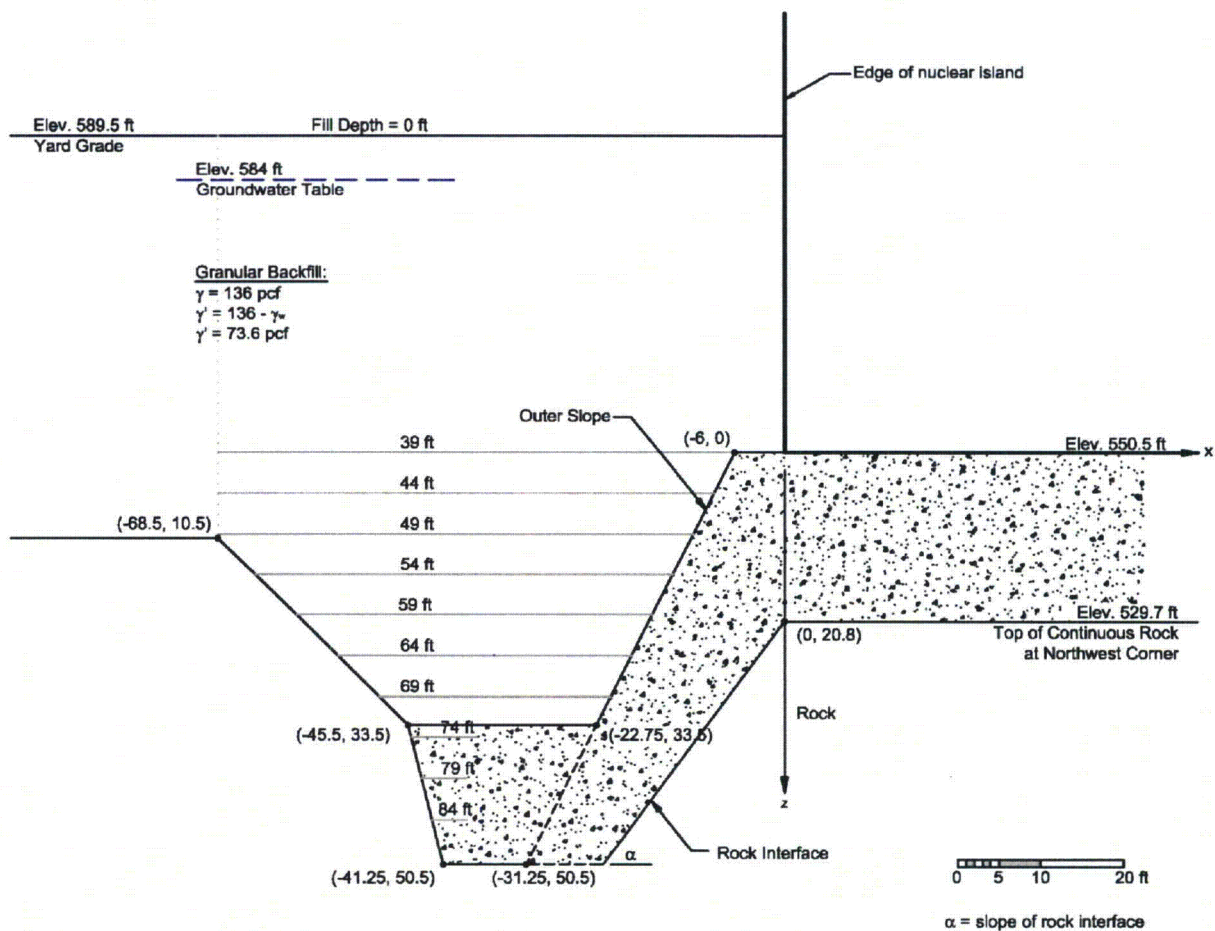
Section Model at Northwest Corner Lee Nuclear Station Unit 1
